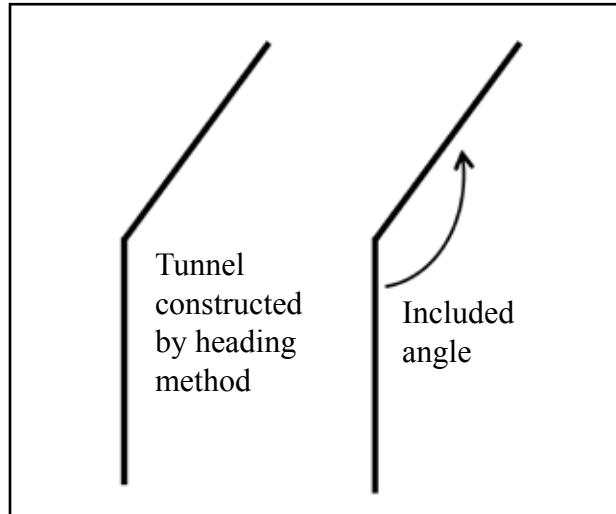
Plan view showing the included angle of a tunnel constructed by heading method.
